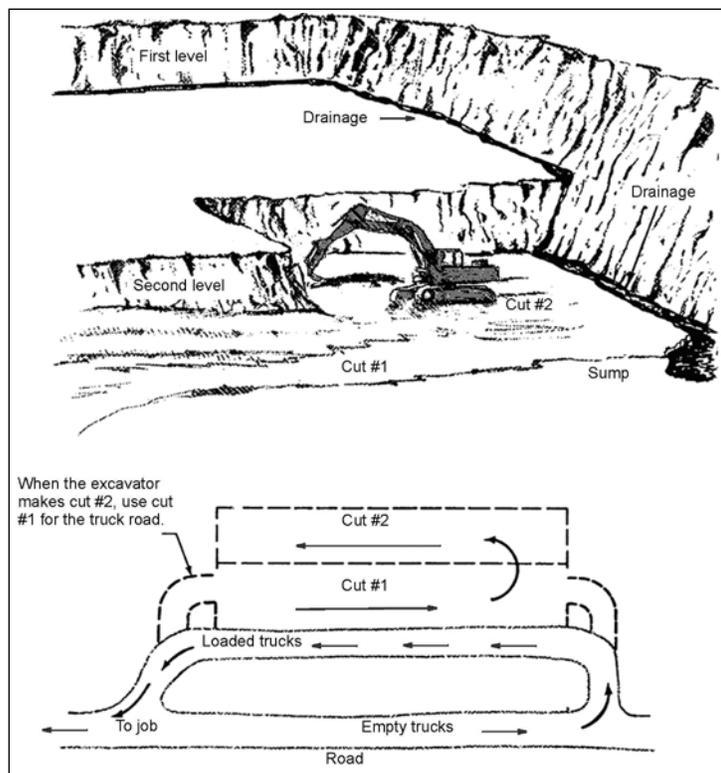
Layout and development of a subsurface pit using the straight-bench method
